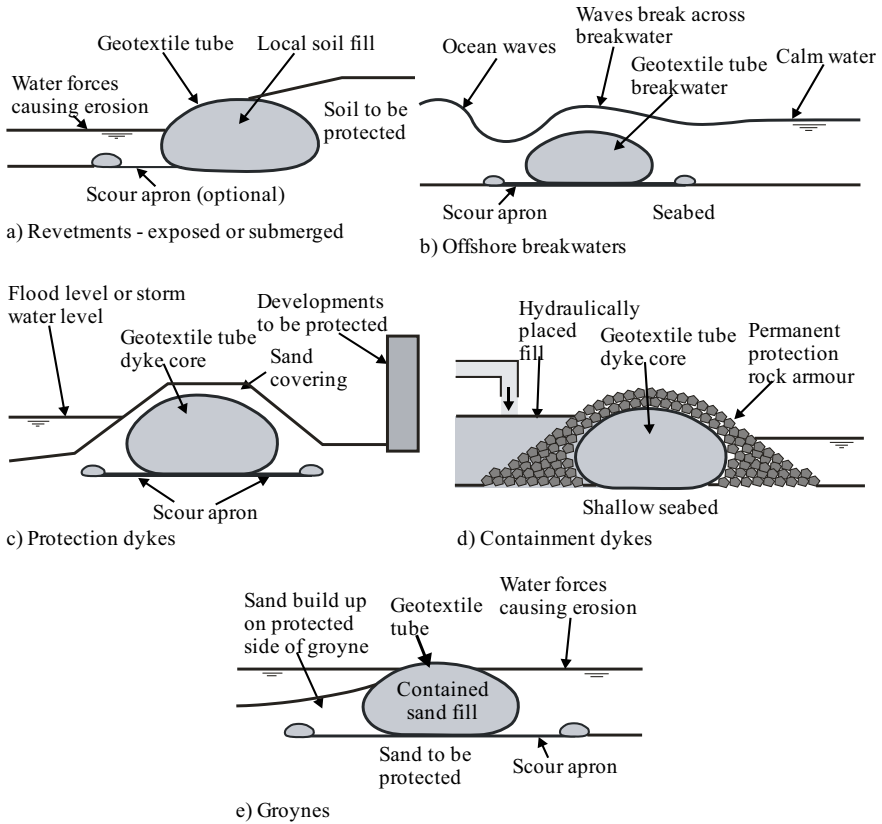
Hydraulic and coastal applications for geotextile tubes
